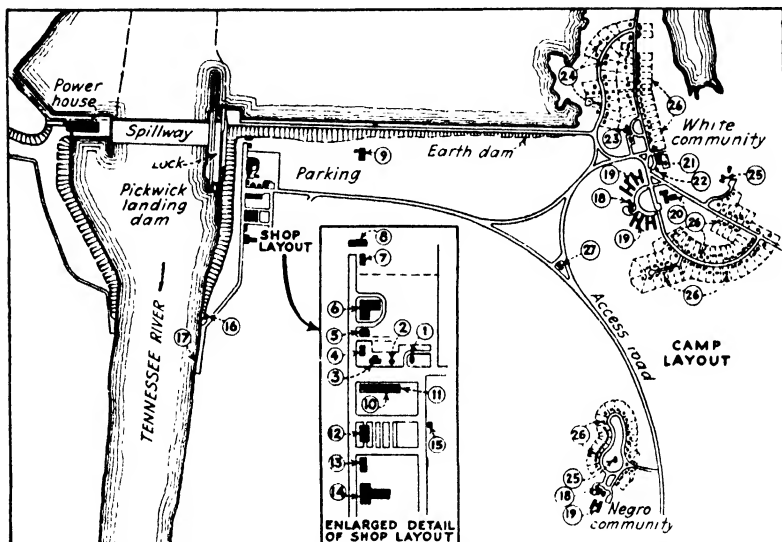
Construction camp and shop layout at Pickwick Landing Dam in Tennessee. Camp site is in wooded area above high water and shops are adjacent to construction operations.
